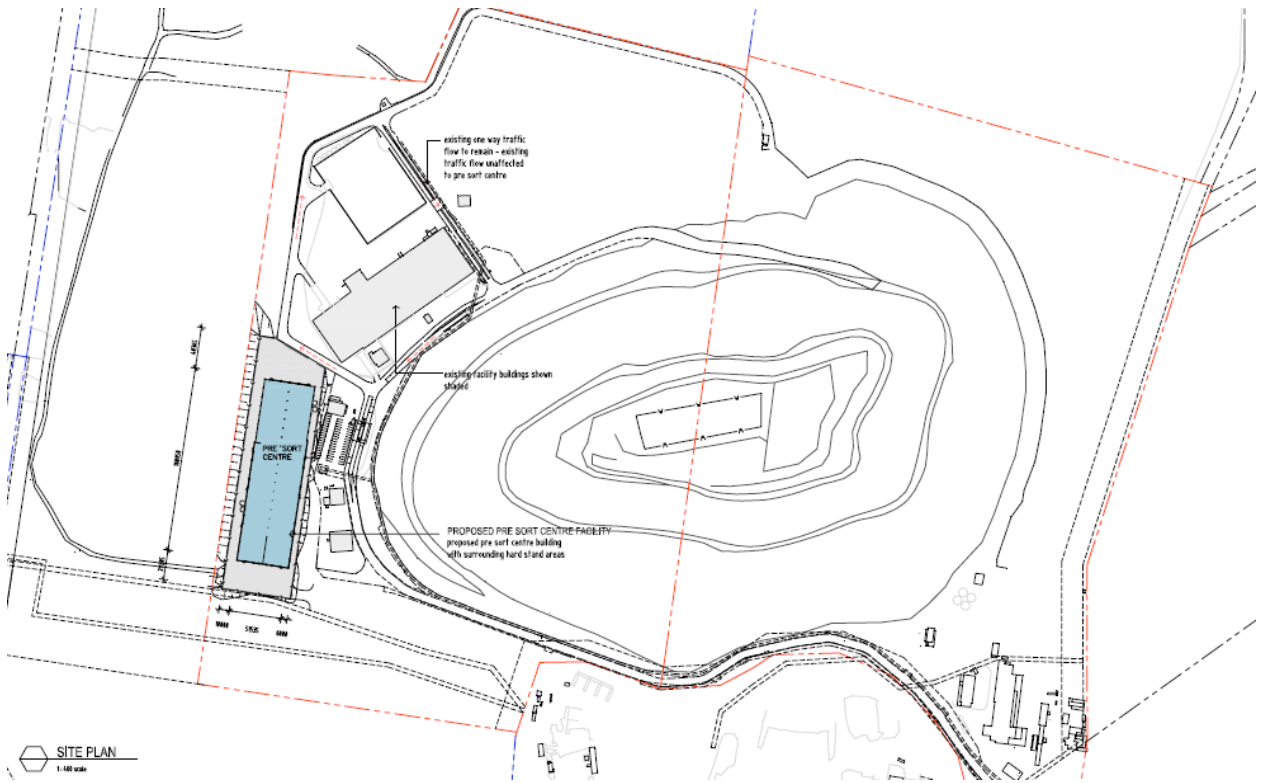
SITE PLAN OF SUBJECT SITE (LOT BOUNDARIES INDICATED IN RED)
